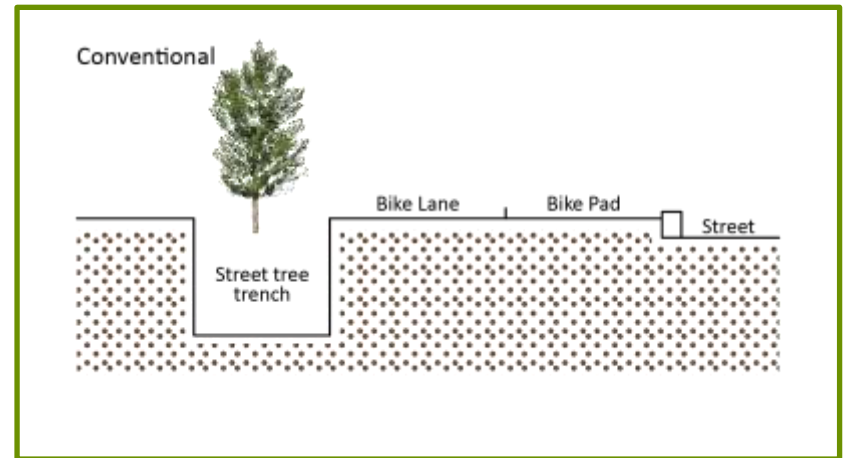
Scenario 2 LCCA Project Plan View Cross-Section View
